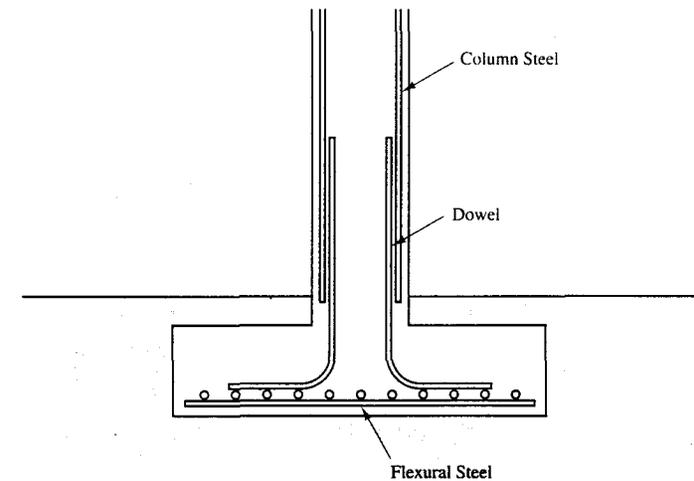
Connection between a concrete or masonry wall and its footing.
